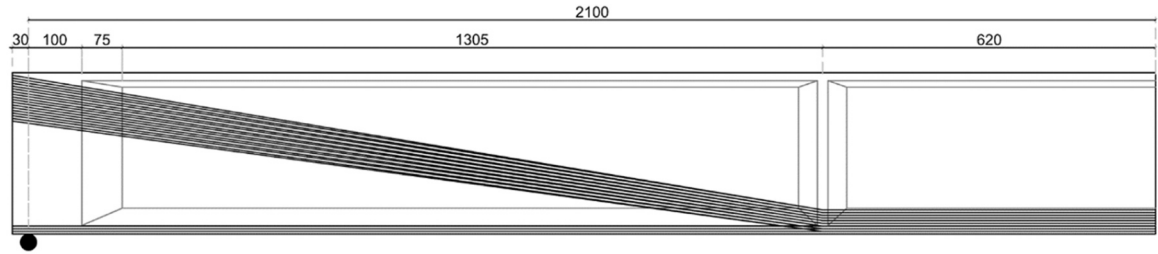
Longitudinal strands layout of the half girder (dimensions in cm).
